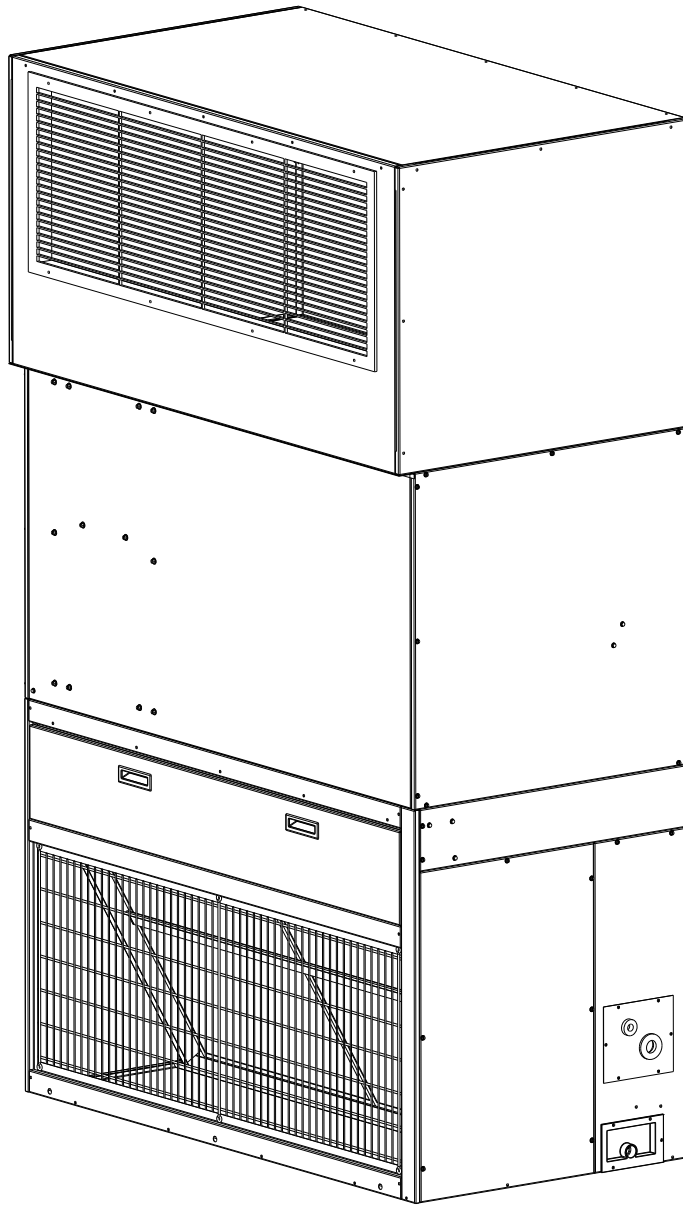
SUPPLY AIR PLENUM MOUNTED ON UNIT
